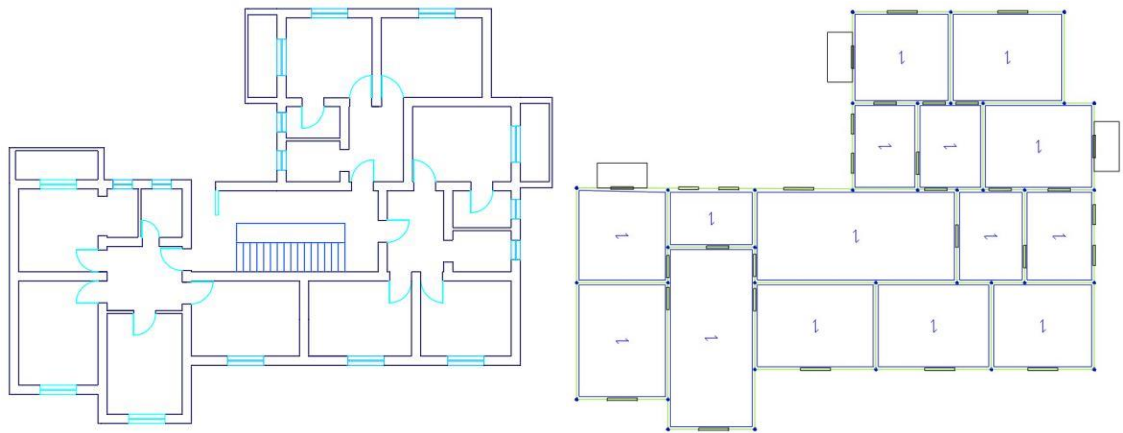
B4 Building plan view in Autocad and model plan view in 3muri
